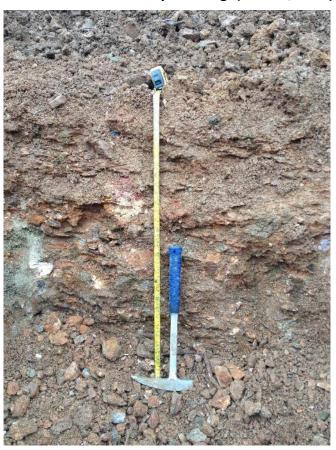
TP17-33 - Gila Conglomerate excavated from trench, forming gravel size cemented fragments. (Feb. 28, 2017)
